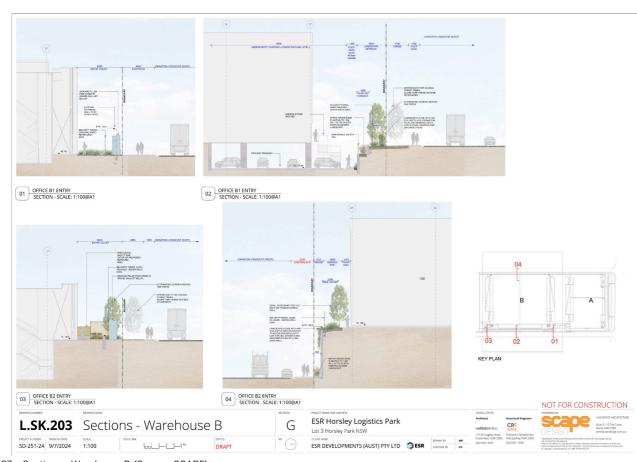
Sections - Warehouse B (Source: SCAPE)
